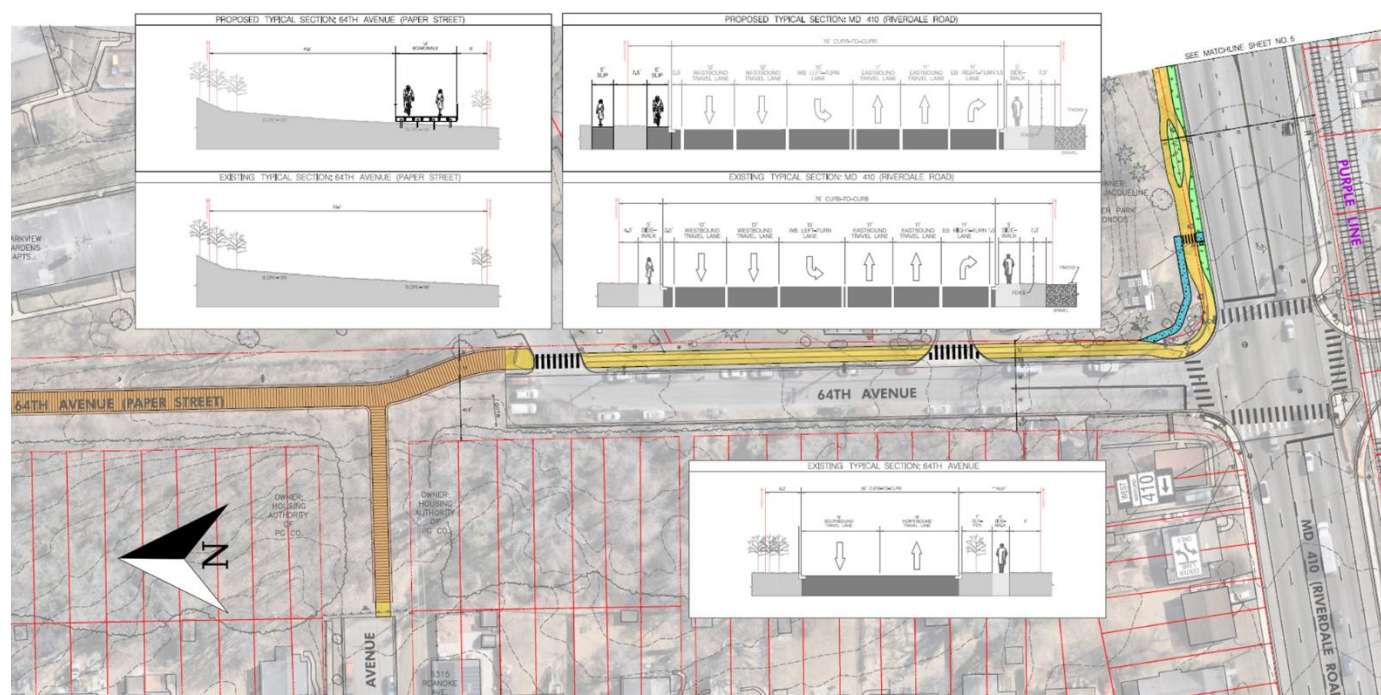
Proposed bike facility along 64th Ave, north of Riverdale Road
